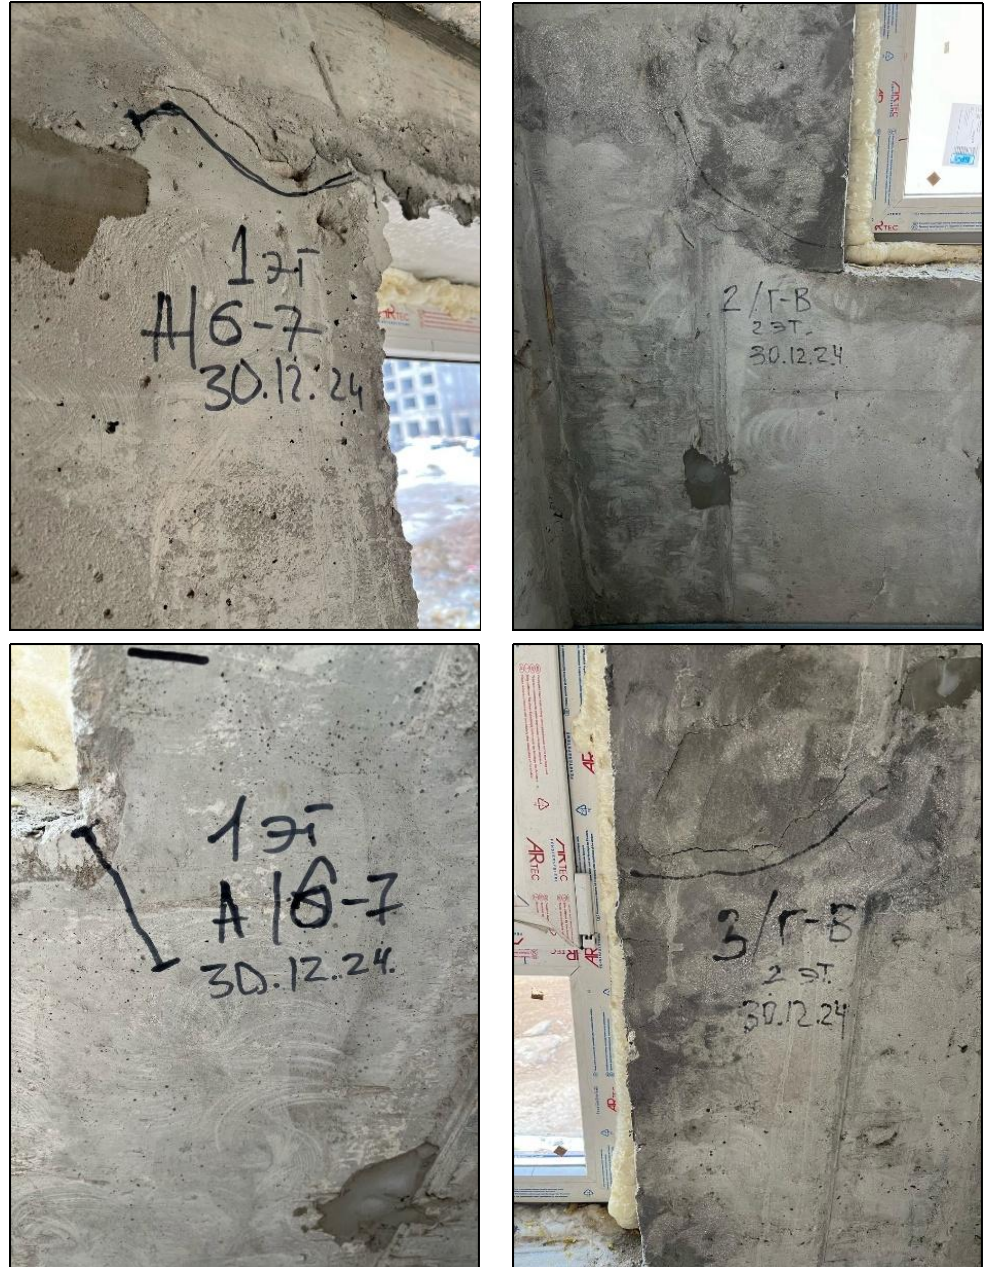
Hairline cracks with an opening width of up to 0.05 mm in door and window openings.
